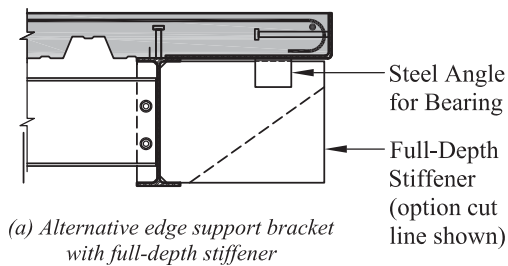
Design concept for slab edge detail where slab is neglected except for in-plane forces and brackets are used.
